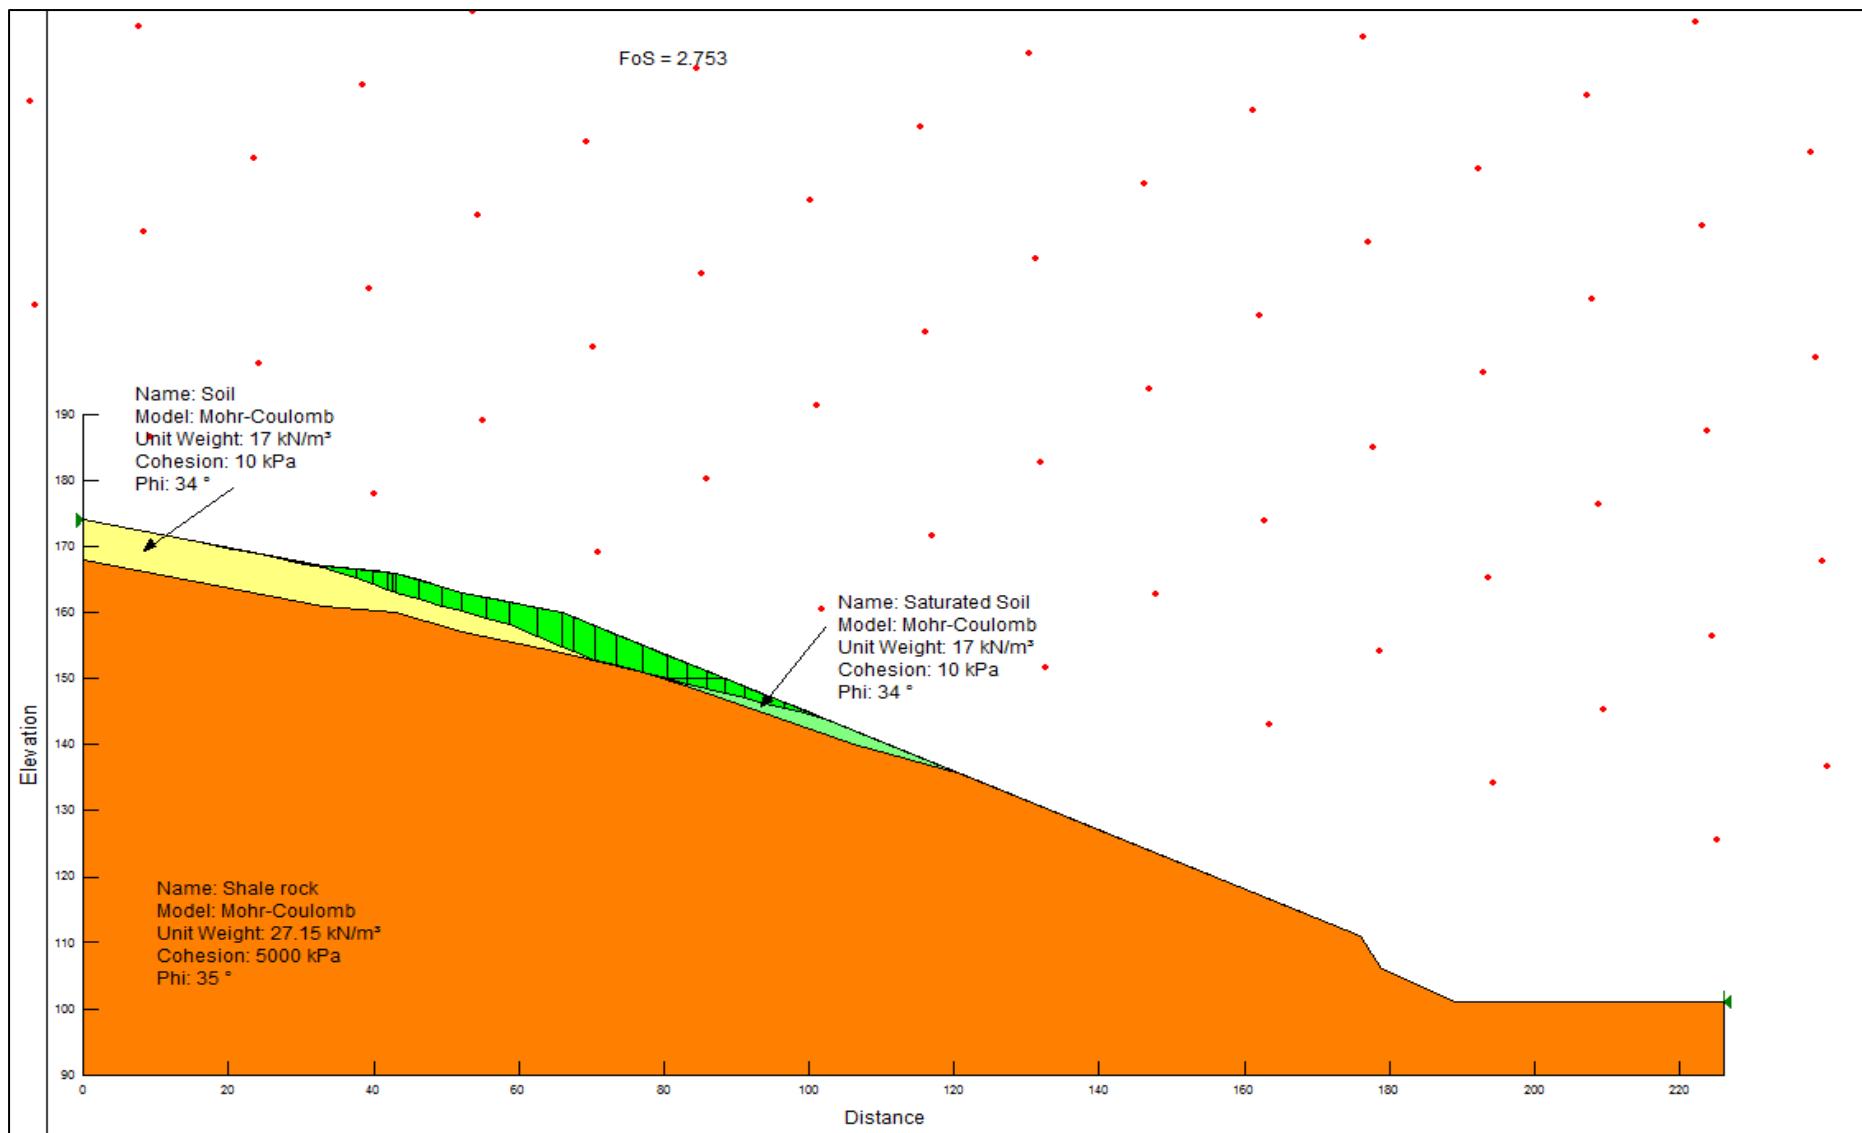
E.8: Inlet portal, Section 2, 1:1.5 excavation slope
